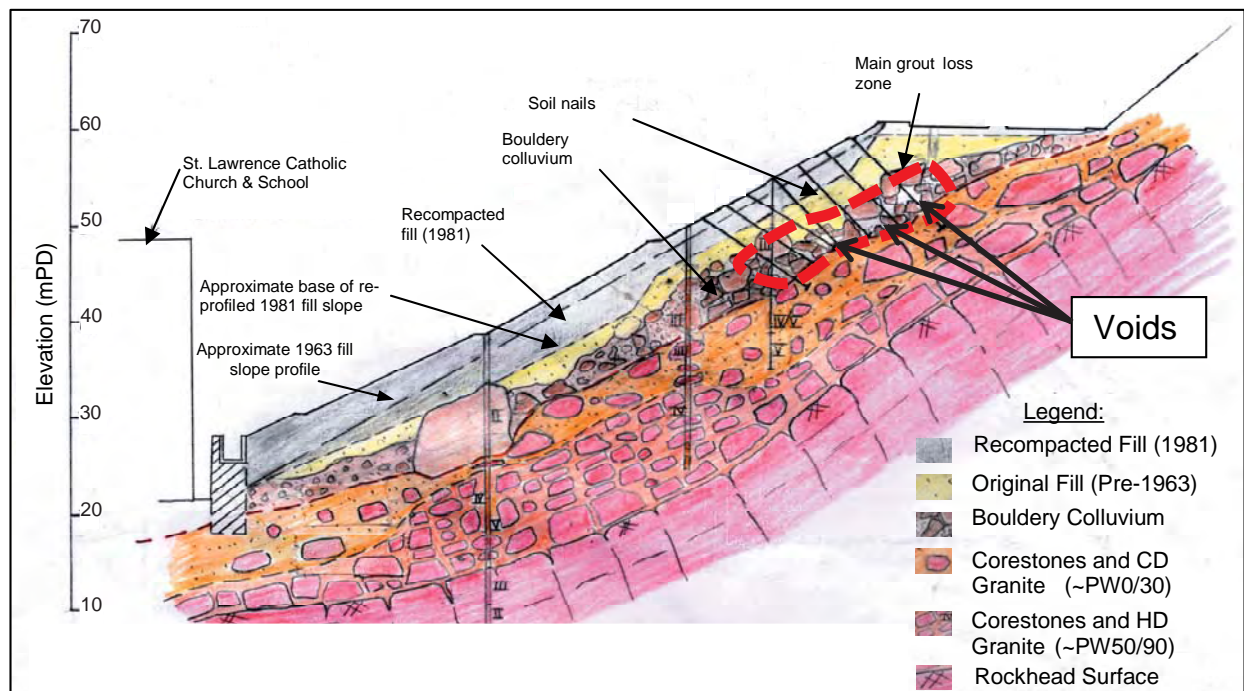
Cross-section through a fill slope below Tai Po Road showing location of soil nail grout loss zone
